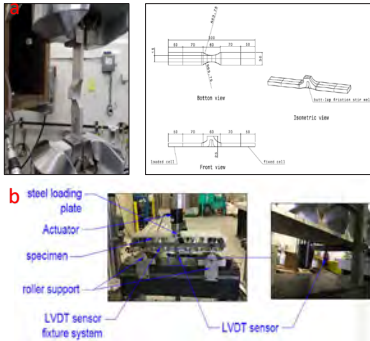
Fatigue testing setup (dimensions in mm): a- small scale (ASTM E466) fatigue specimens, b- large scale fatigue specimens (aluminum alloy for both specimens is 6063-T6)
